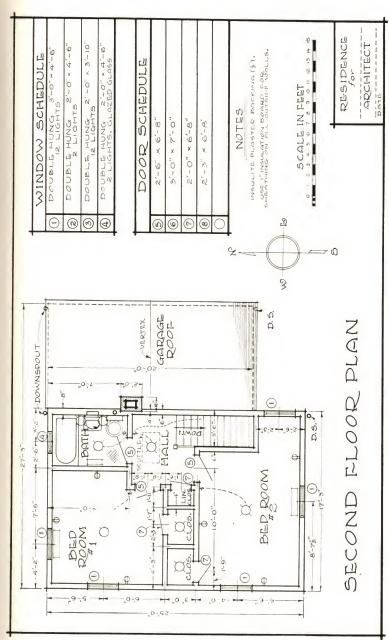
Second-Floor Plan for House Shown in Fig. 30
